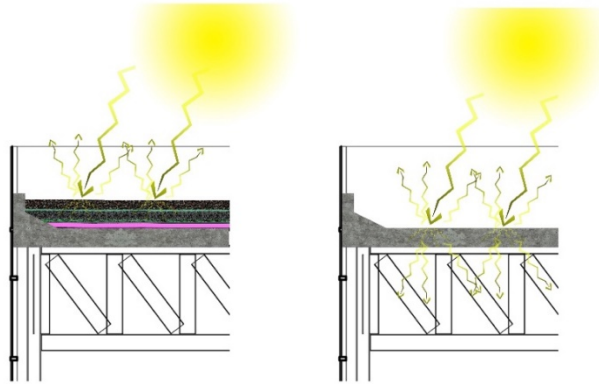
Insulation of a Green Roof (left) compared to a conventional roof (right) - Patricia Horn
